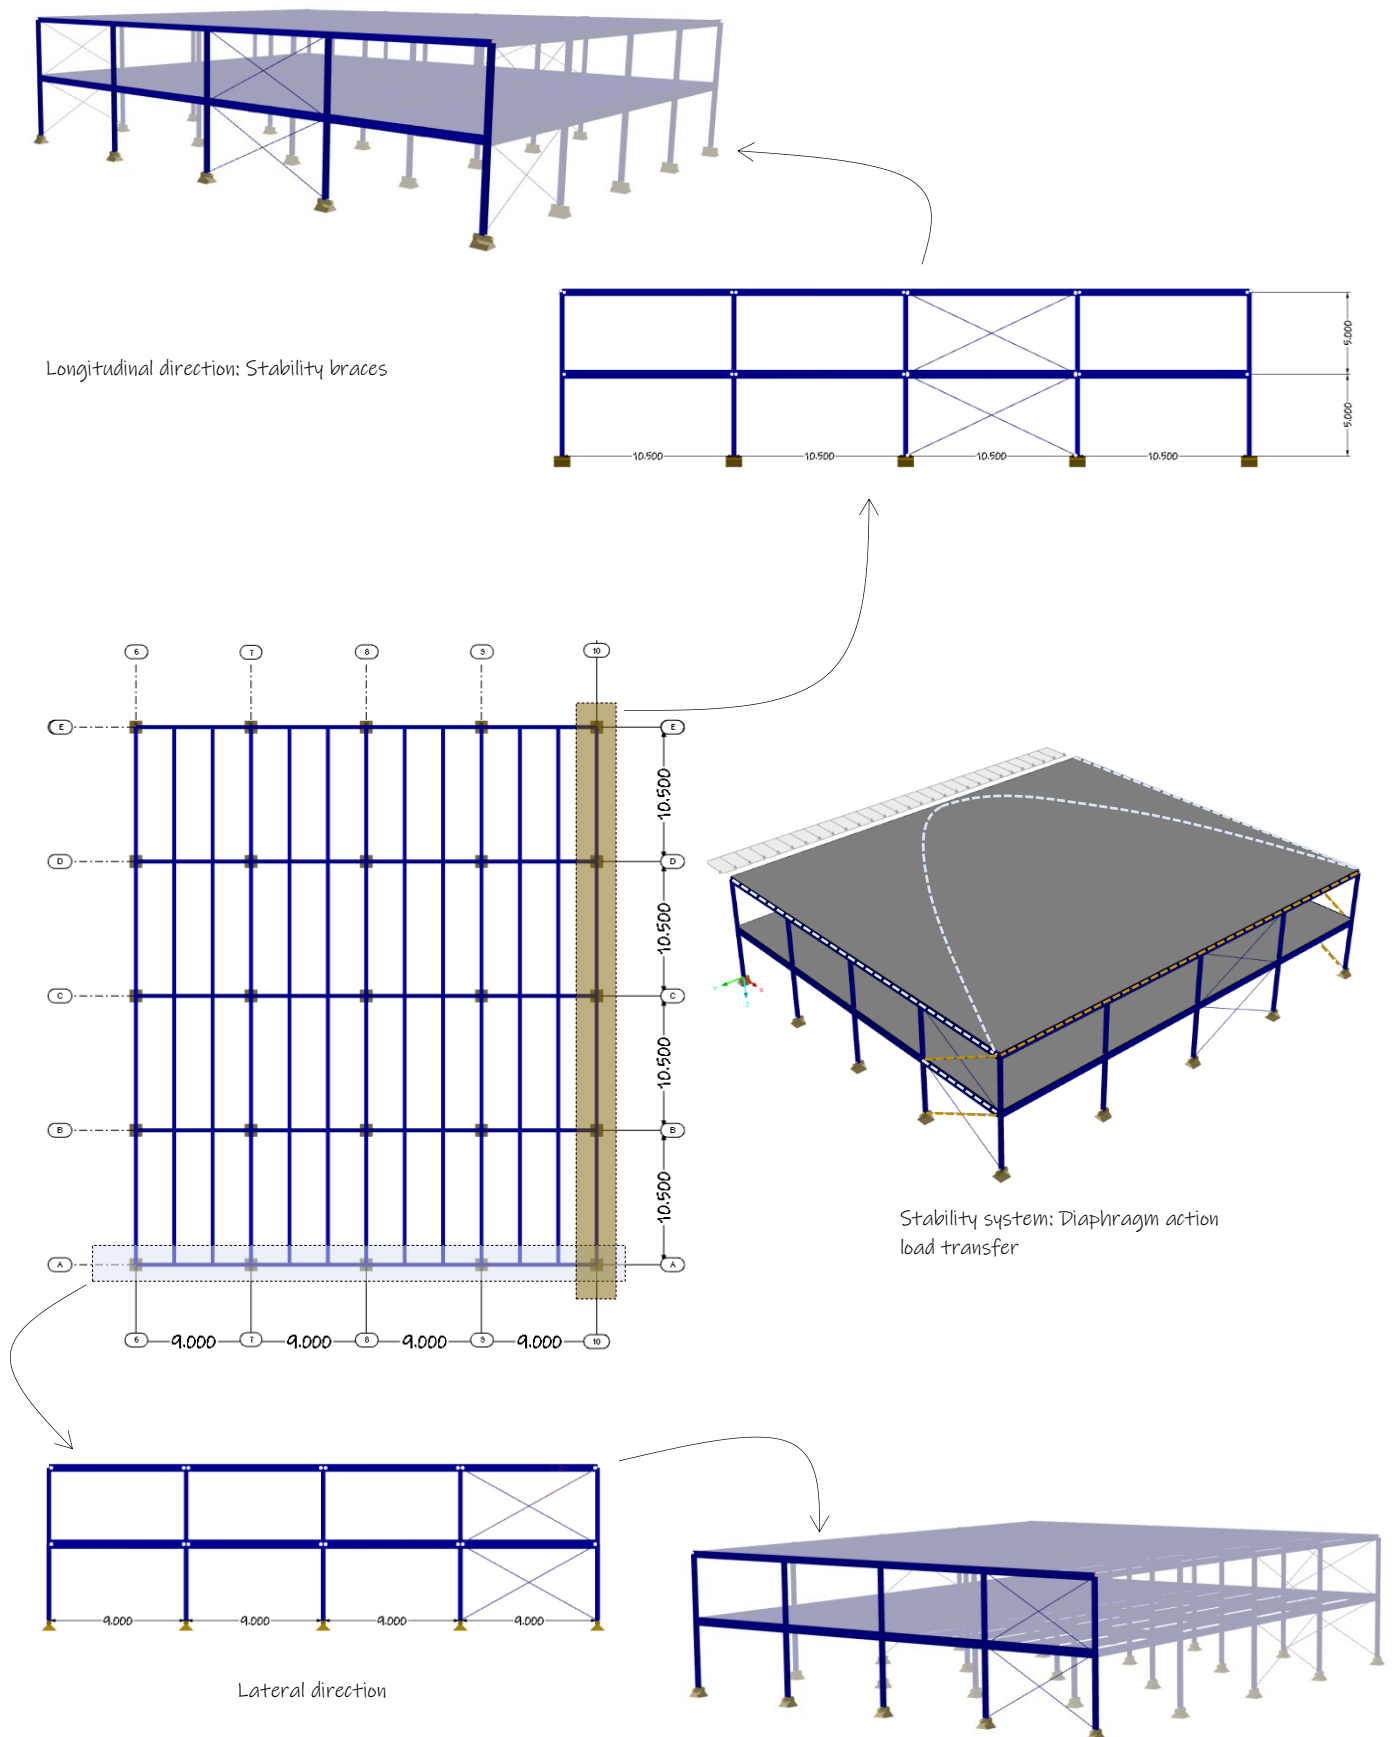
Base design conceptual structural overview: Side views, floor plan, and stability system
